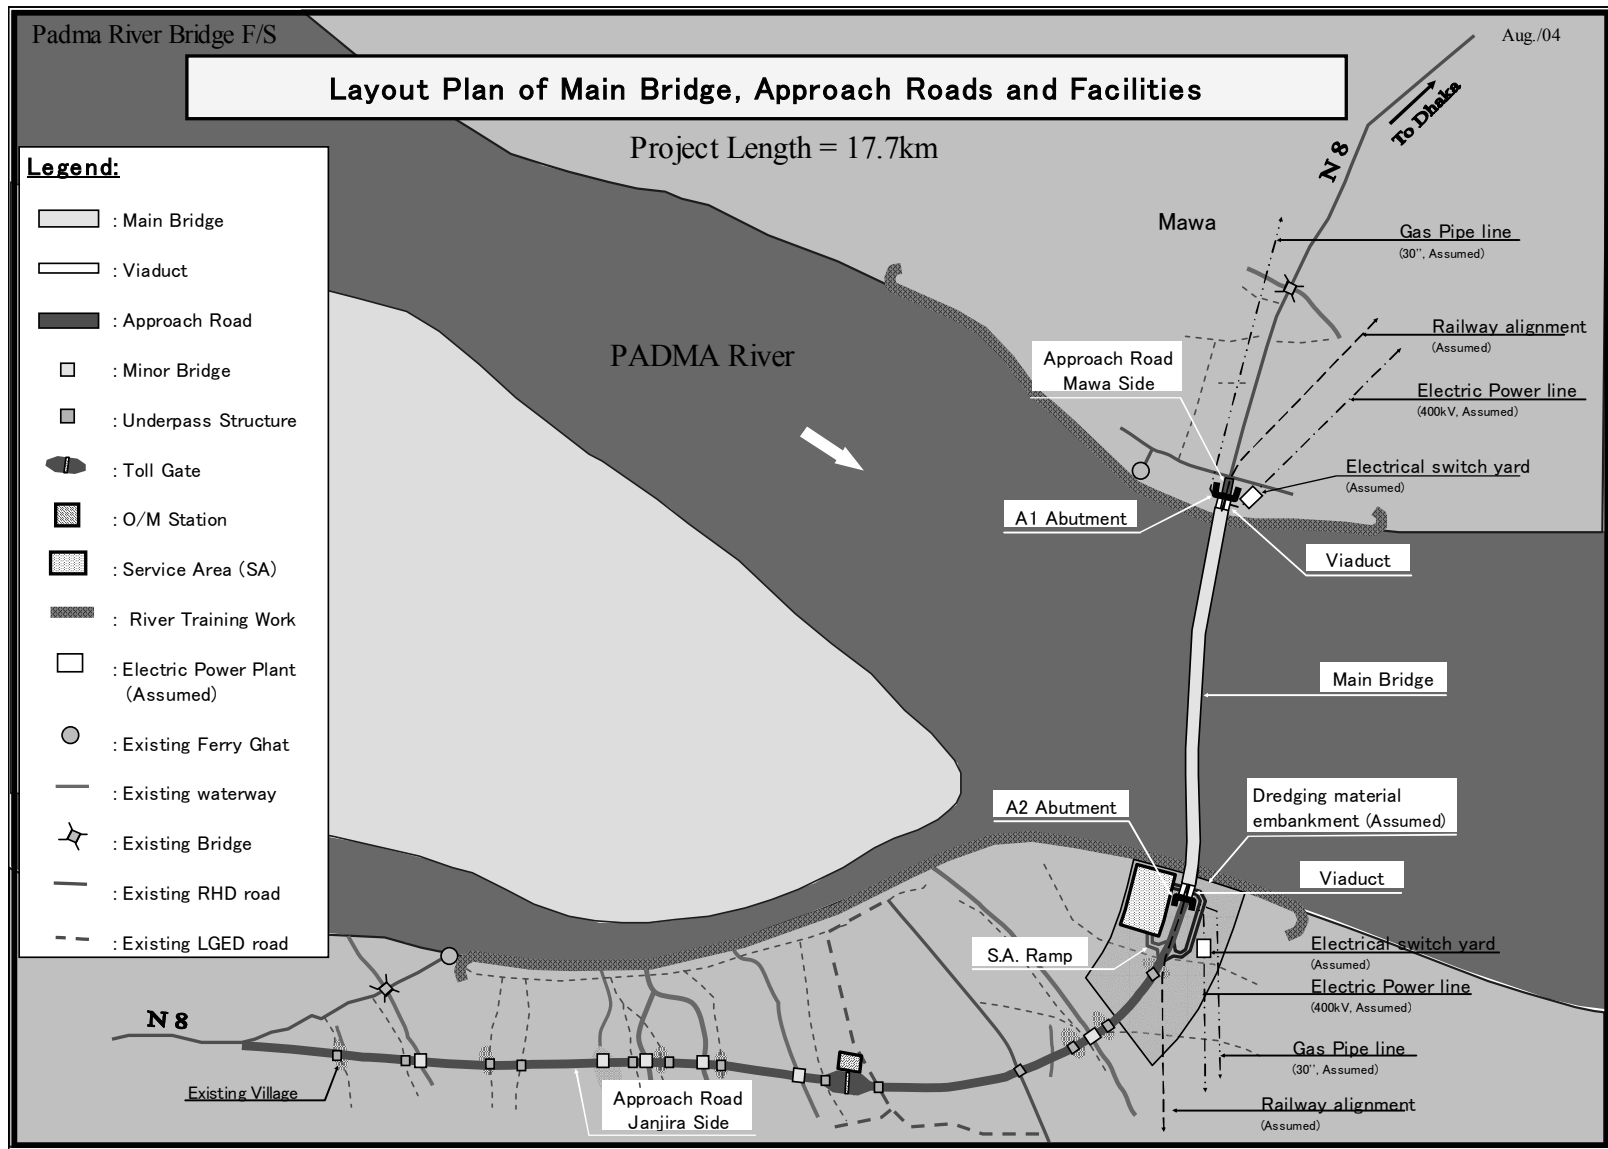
Layout Plan for Facilities on Project Highway
